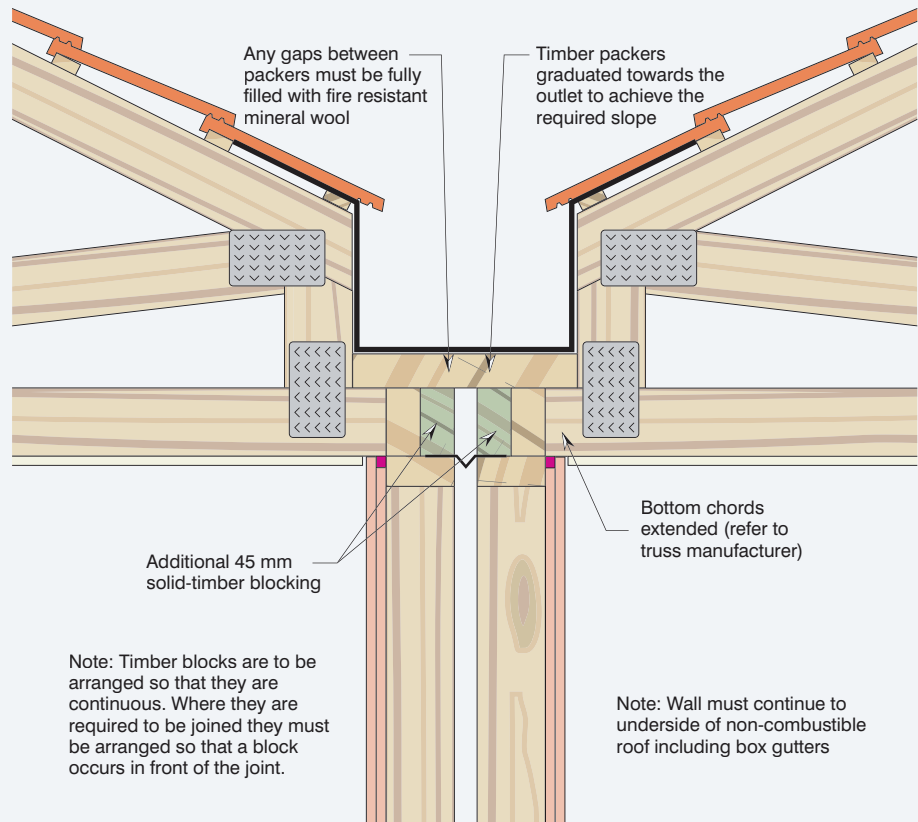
Timber blocks used to maintain fire-resistance – FRL 60 minutes under box gutter – elevation view.
